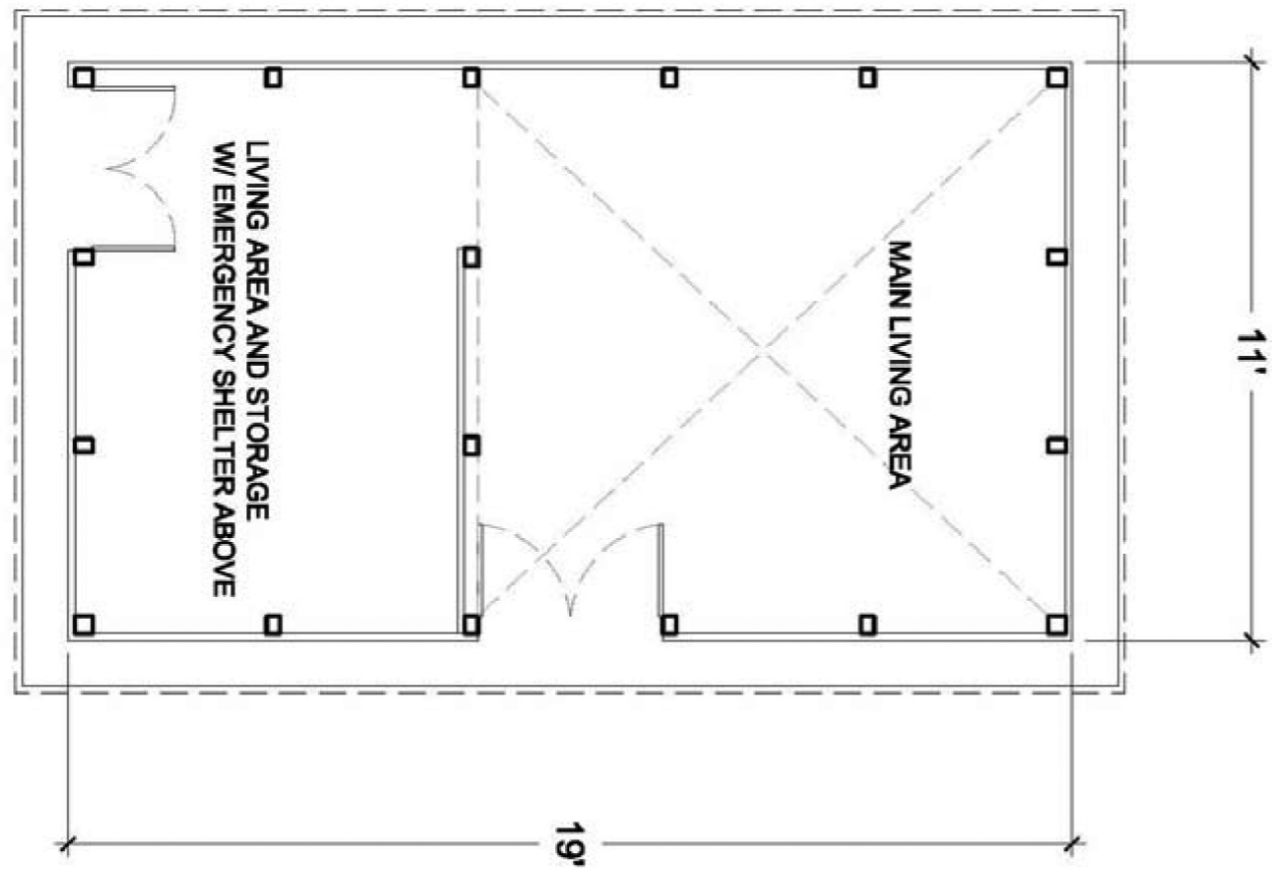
Plan of the demonstration house. The other houses constructed by the local design and construction team were different in size respecting the need of users. Some owners also added verandah with their houses.
